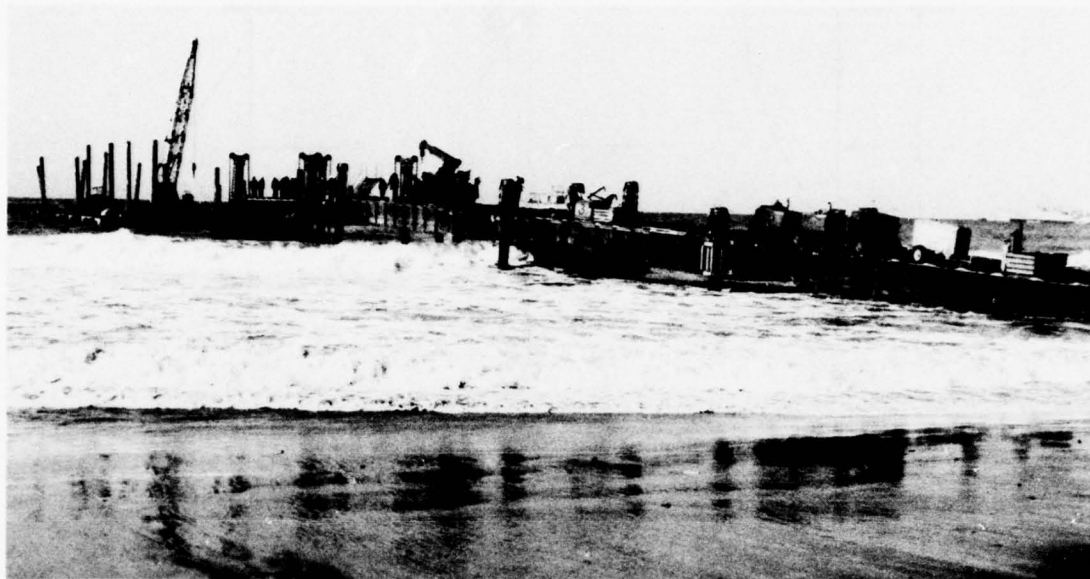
Welding equipment on pier to weld pile connections.
